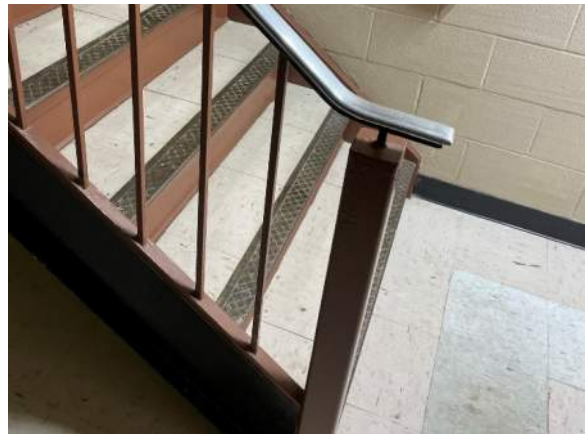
Typical stair with guardrail/handrail not complying with current dimensional requirements.
